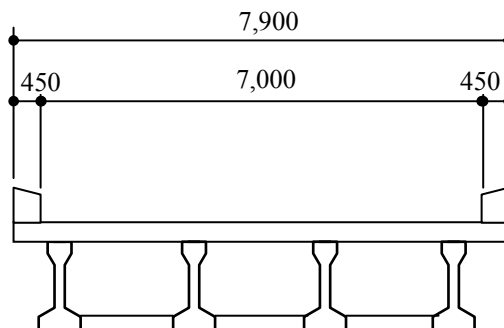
Typical Cross Section of Ramp Bridge (1-Lane)
